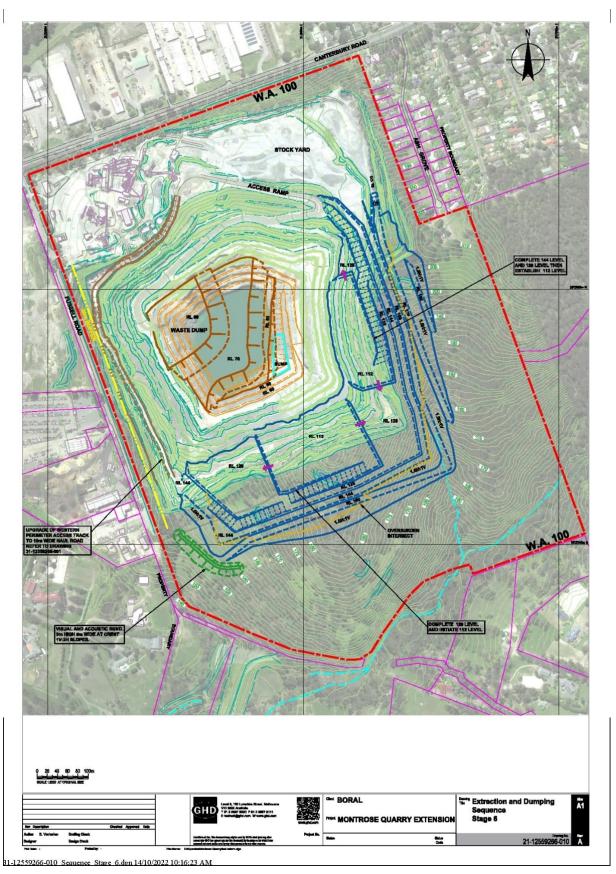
Proposed Expanded Pit – Stage 6 (source GHD)
